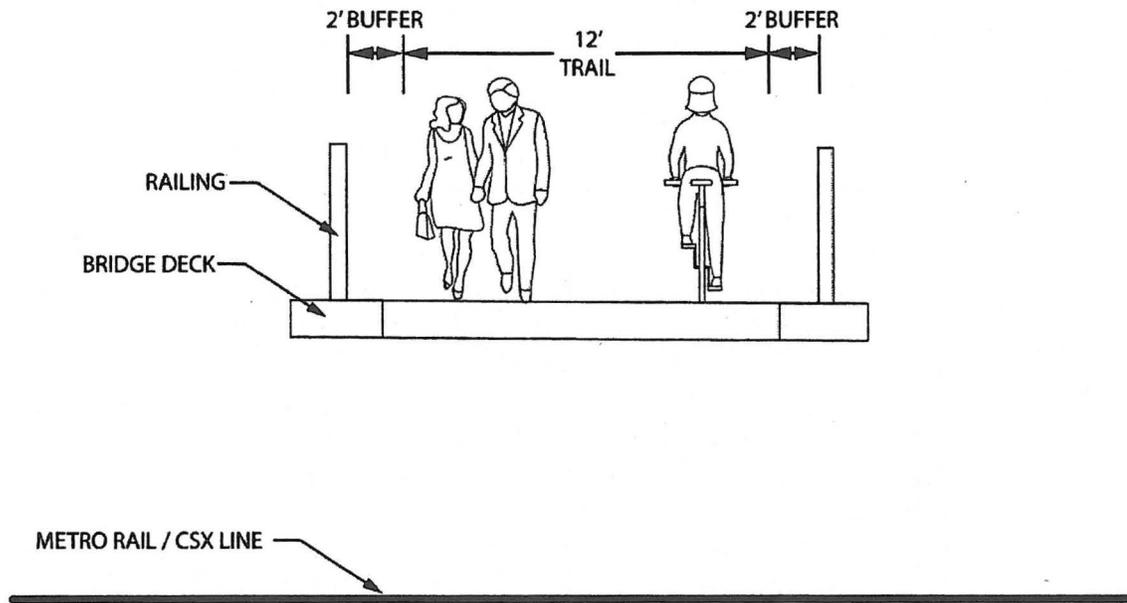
Typical Pedestrian Bridge Cross Section Over Metro Green Line/MARC Camden Line/CSX tracks
